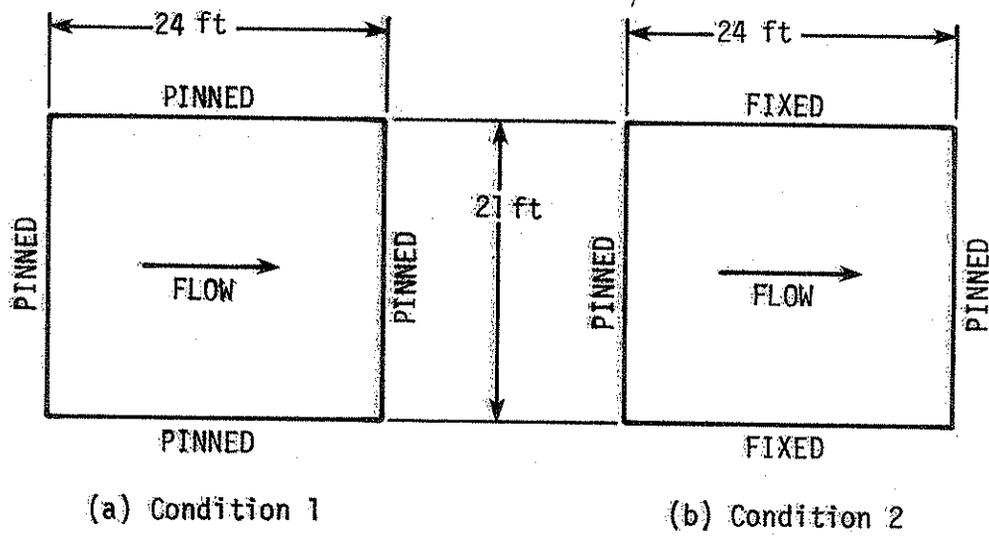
Plan view of stilling basin with assumed edge conditions -- Flume No. 2.
